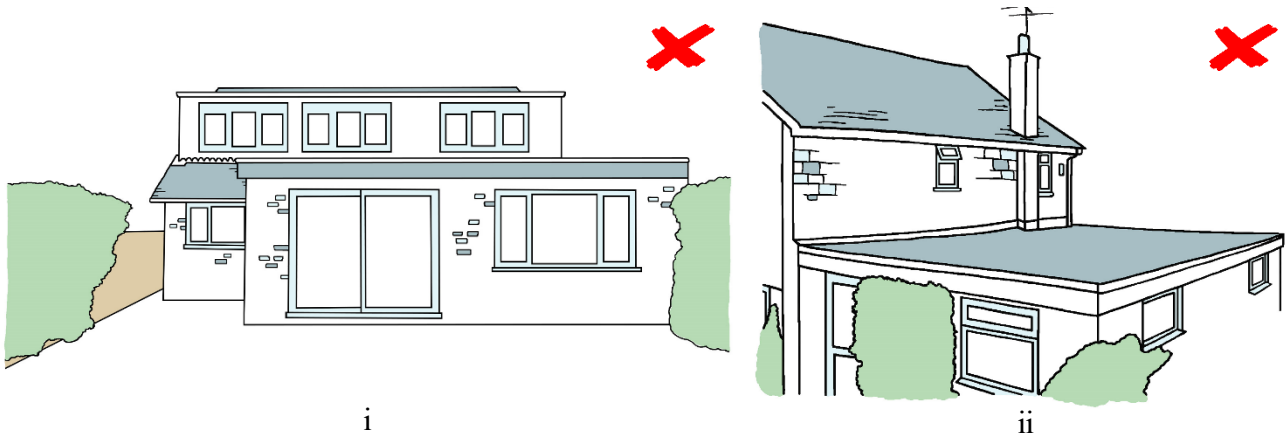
G: Examples of Poorly Designed Flat Roof Extensions
